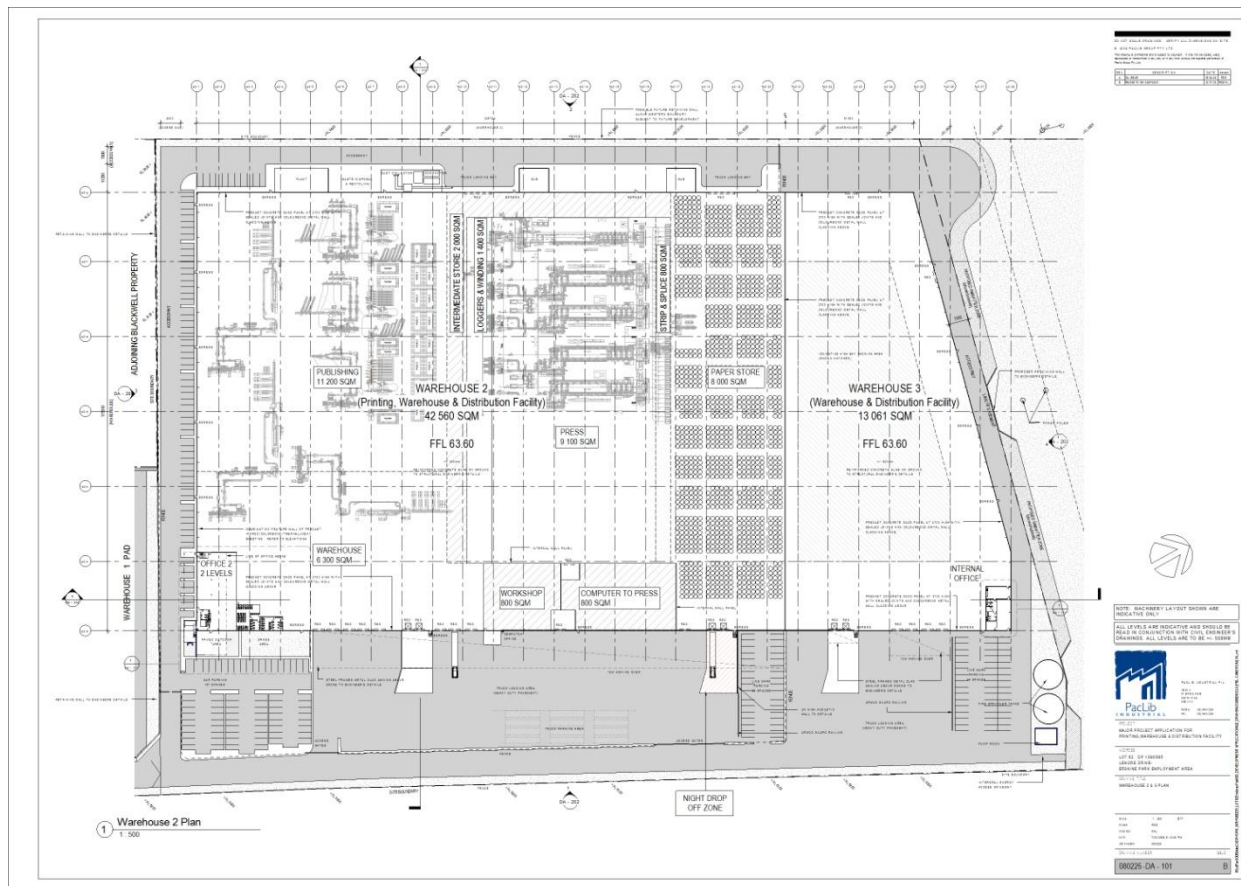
Site plan of Warehouse 2 and 3- showing fitout of printing facility.
